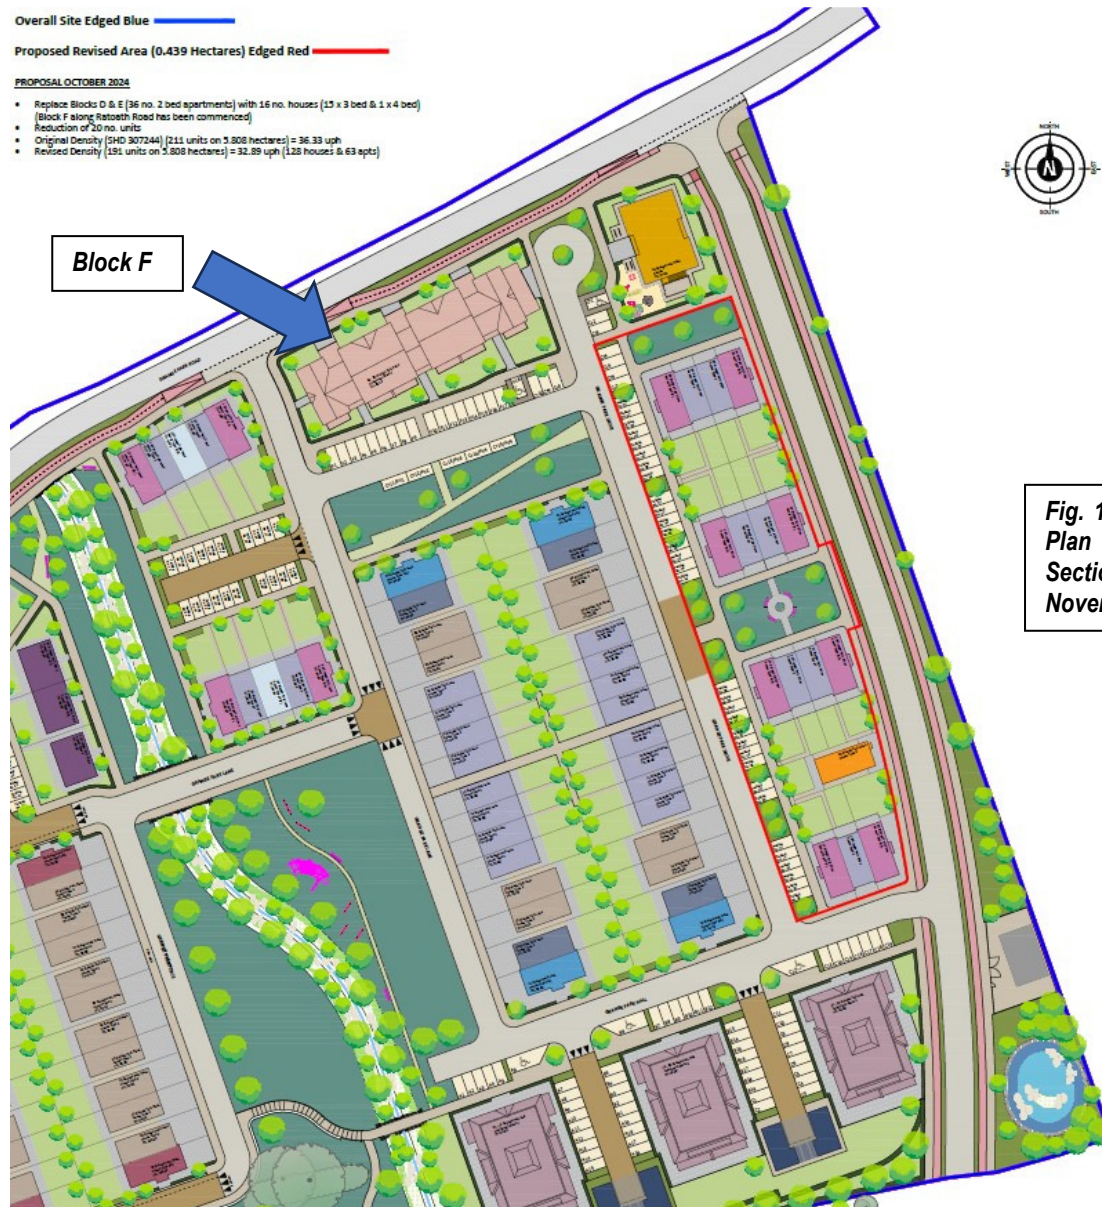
Extract of Site Layout Plan submitted for first Section 247 meeting in November 2023
